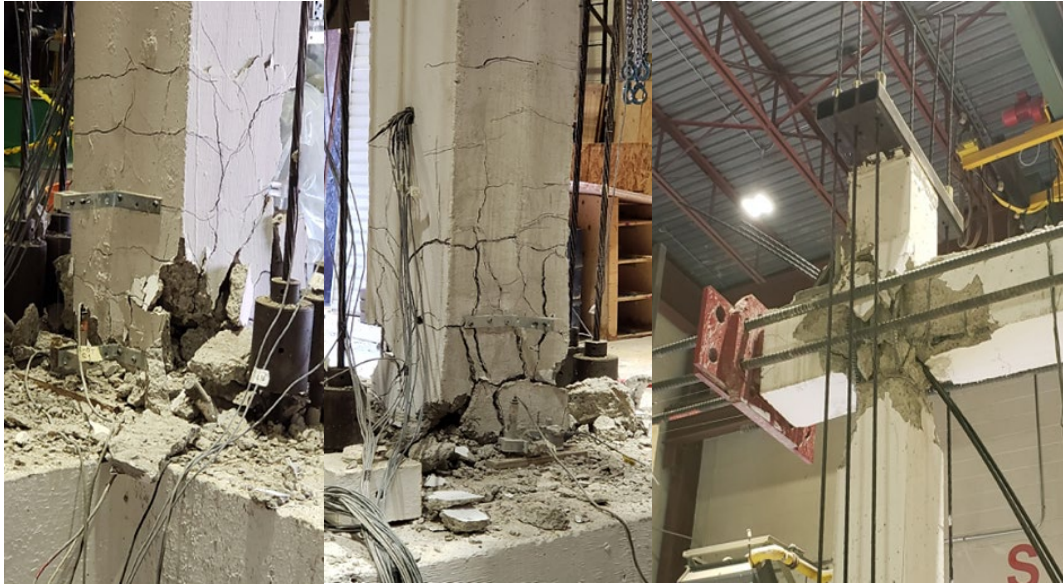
Crushing of concrete and buckling of column reinforcement at 4.0 % drift during Test 2
